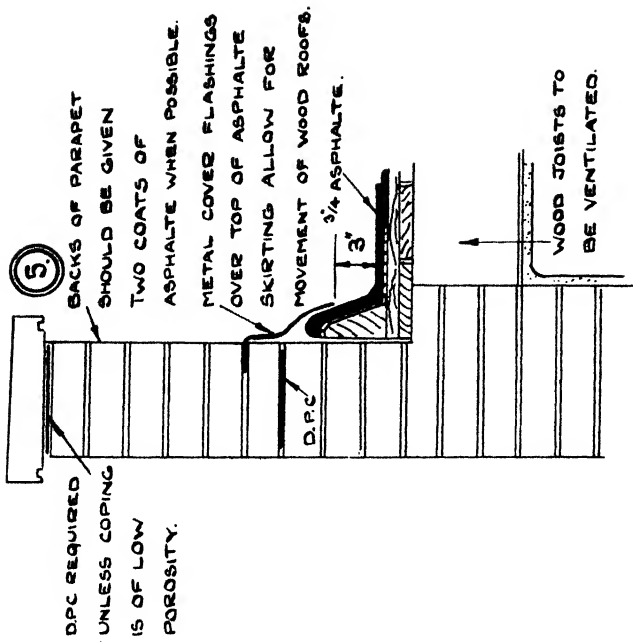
ALTERNATIVE ASPHALTE FINISH ON TIMBER ROOF
